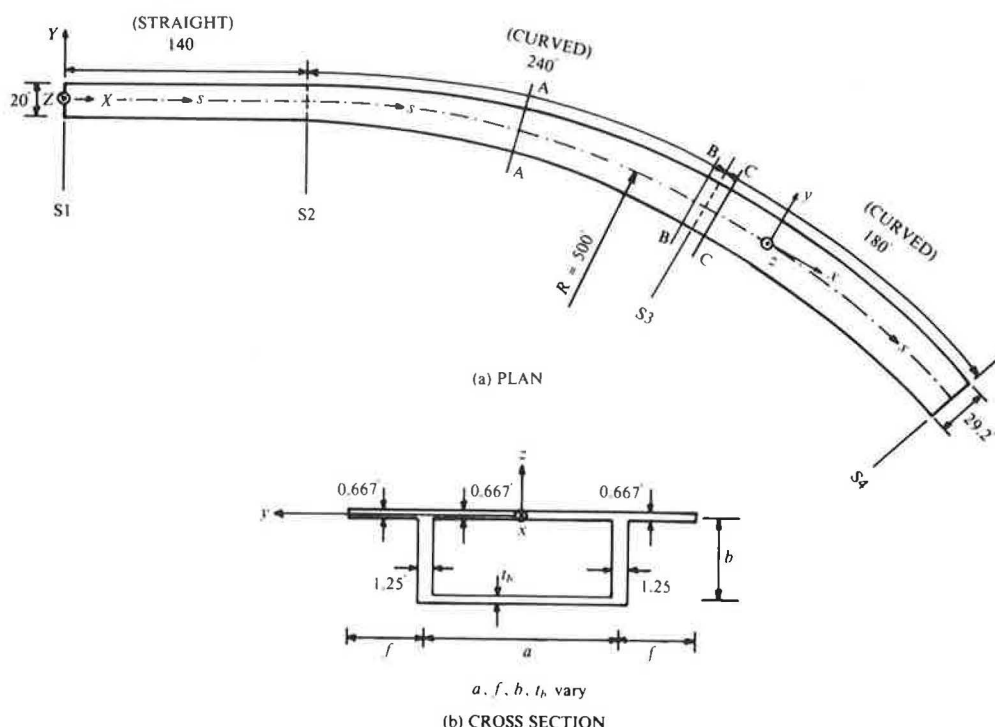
Example 1: three-span curved nonprismatic prestressed concrete bridge. (a) Plan view, (b) cross section.
